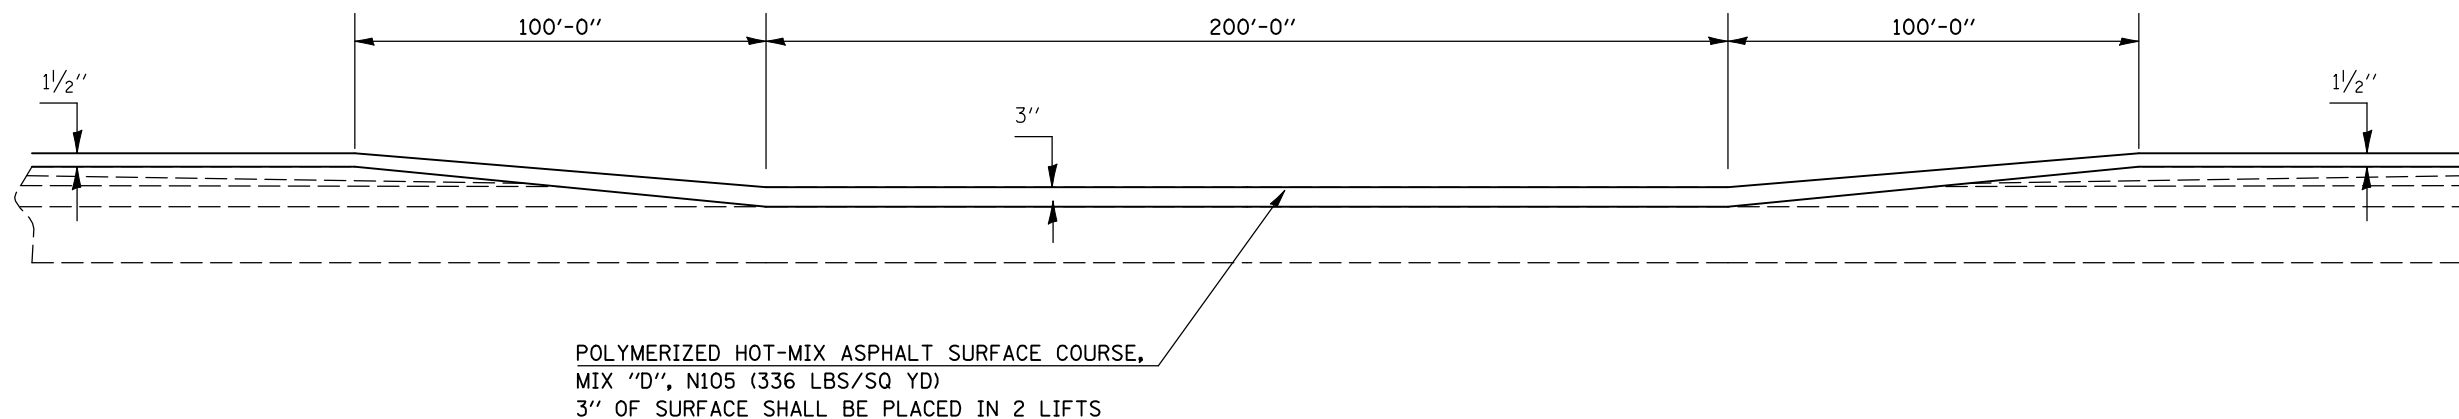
DETAIL FOR PASSING LANE PAVING TRANSITION UNDER OVERHEAD STRUCTURES
